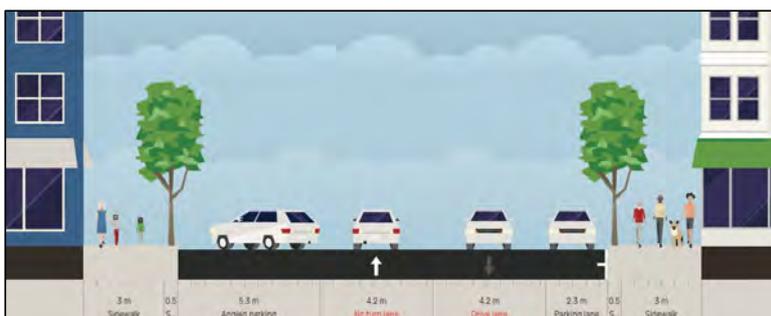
Existing Main Street cross section (between pedestrian crossing and Station Street)
